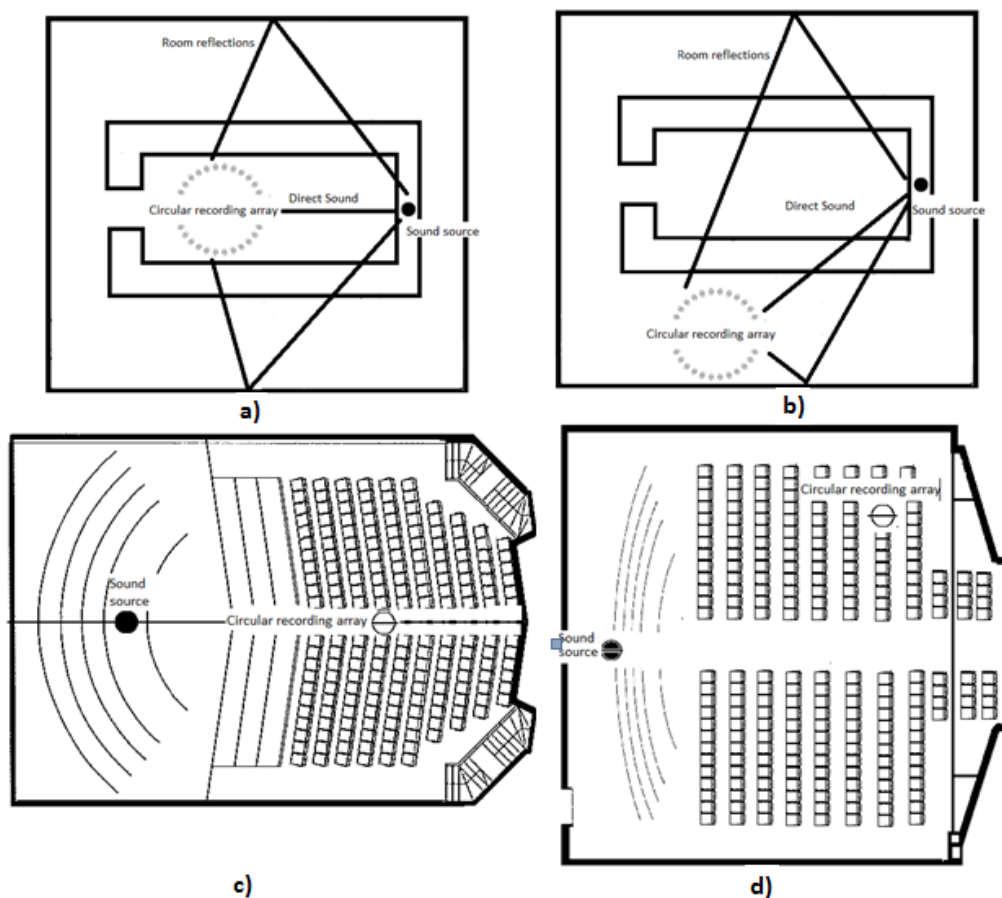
Floorplan of the hall 1 (a, b), hall 2 (c) and hall 3 (d).
